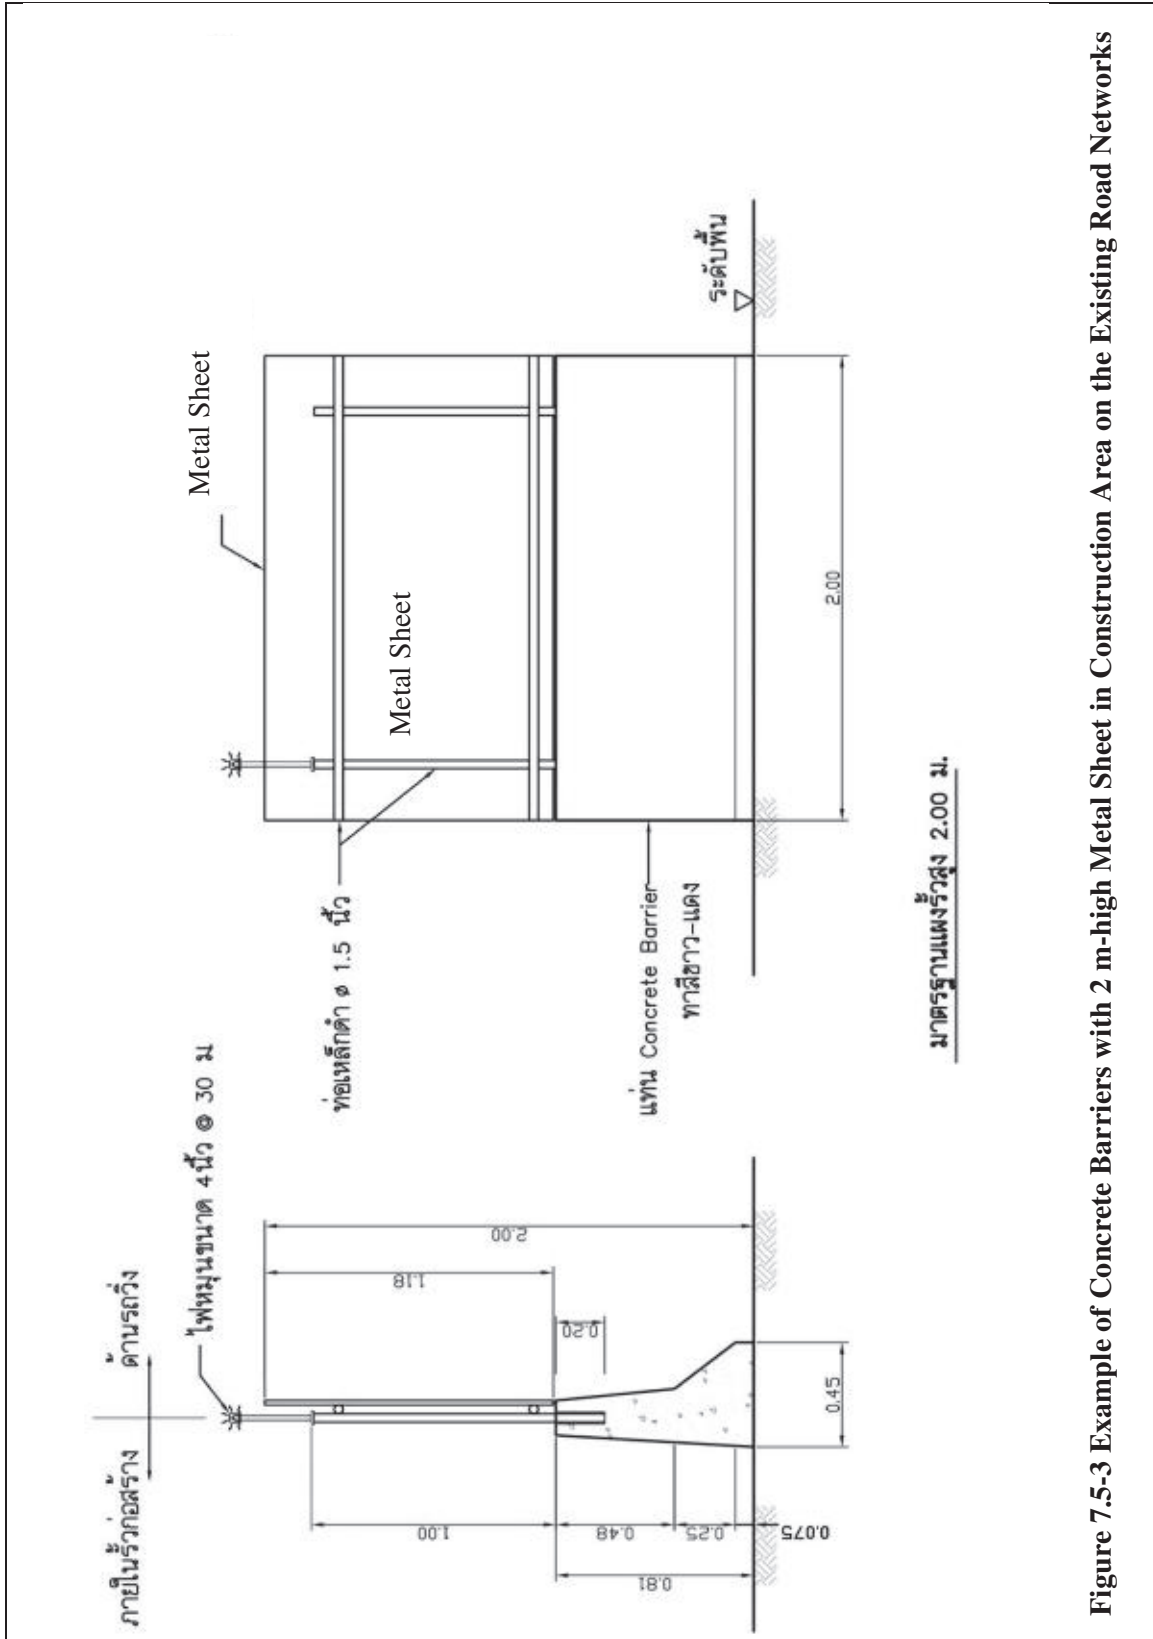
Example of Concrete Barriers with 2 m-high Metal Sheet in Construction Area on the Existing Road Networks
